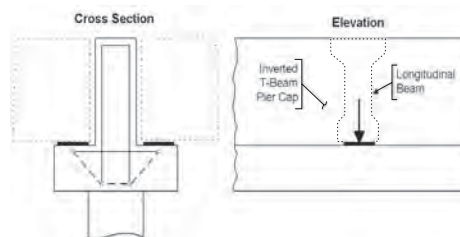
Inverted T-Beam Pier Cap.
